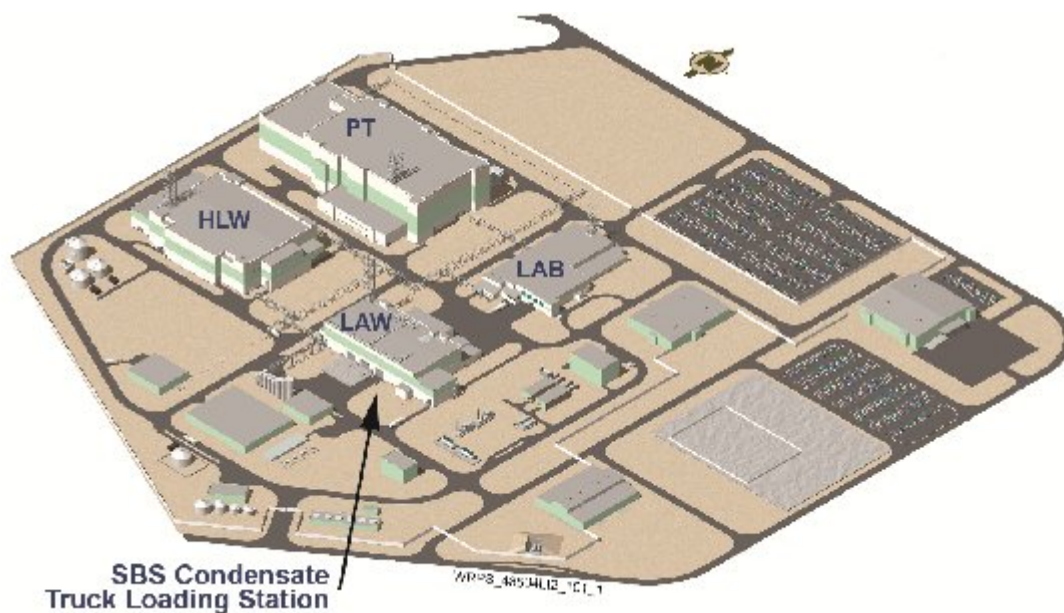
This Figure Shows the WTP Facility Layout SBS Condensate Truck Loading Station Location.
